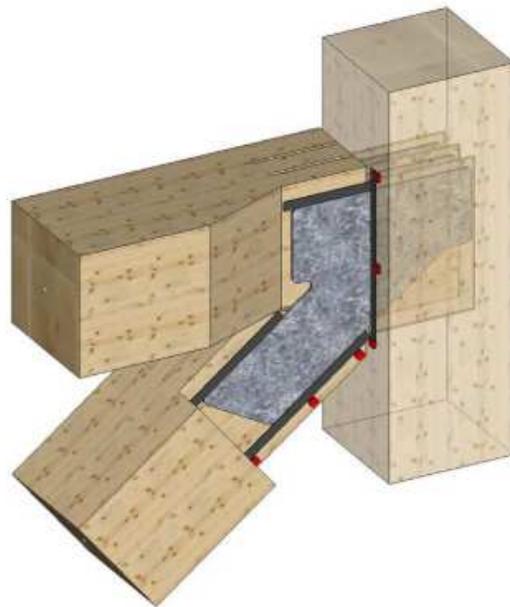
3D render of a Beam/Column connection (Abrahamsen, 2017)
